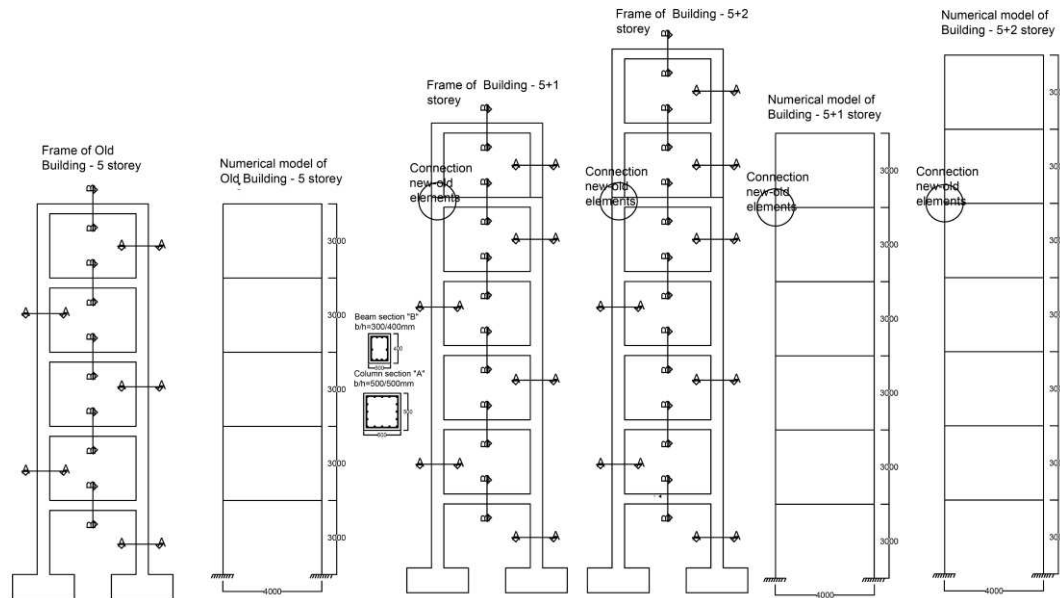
Numerical model and column and beam cross-sections of the old frame and the frames with additional floors.
